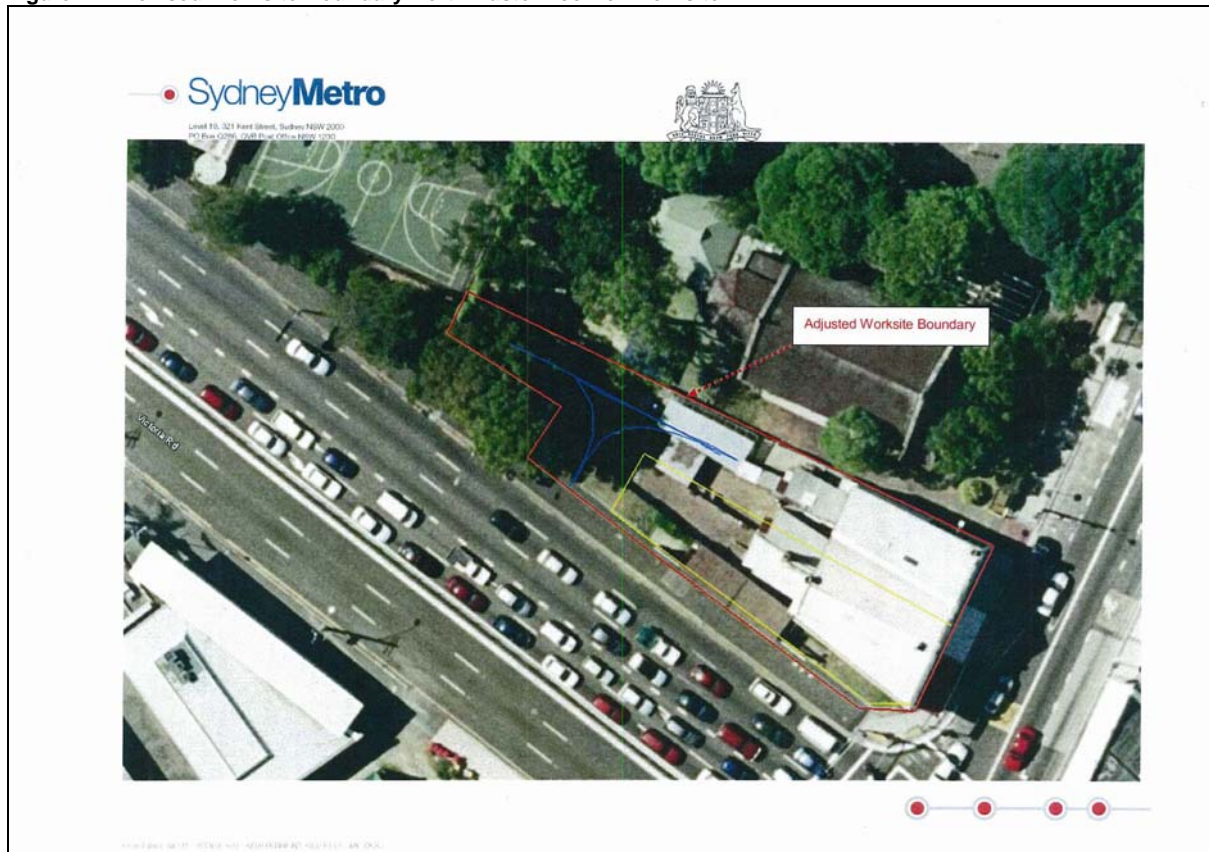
Rozelle Station – Worksite Locations and Access Proposals
